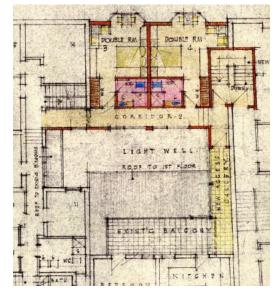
Rear of 139–141 George Street, Second Floor c.1985 (detail). The two double rooms indicated are today's Room 15 (2.48) and Room 16 (2.46), although 2.48 has recently been altered to provide an accessible bathroom. The existing balcony shown at the bottom of the drawing was later modified to connect across to the party wall with The Russell Hotel and, via a new opening, into the second floor of The Russell Hotel. This opening has been infilled, but it connected into the northern wall of today's bathroom, 2.12. Source: PMNSW – ROX 410 AR 0001/DR.
